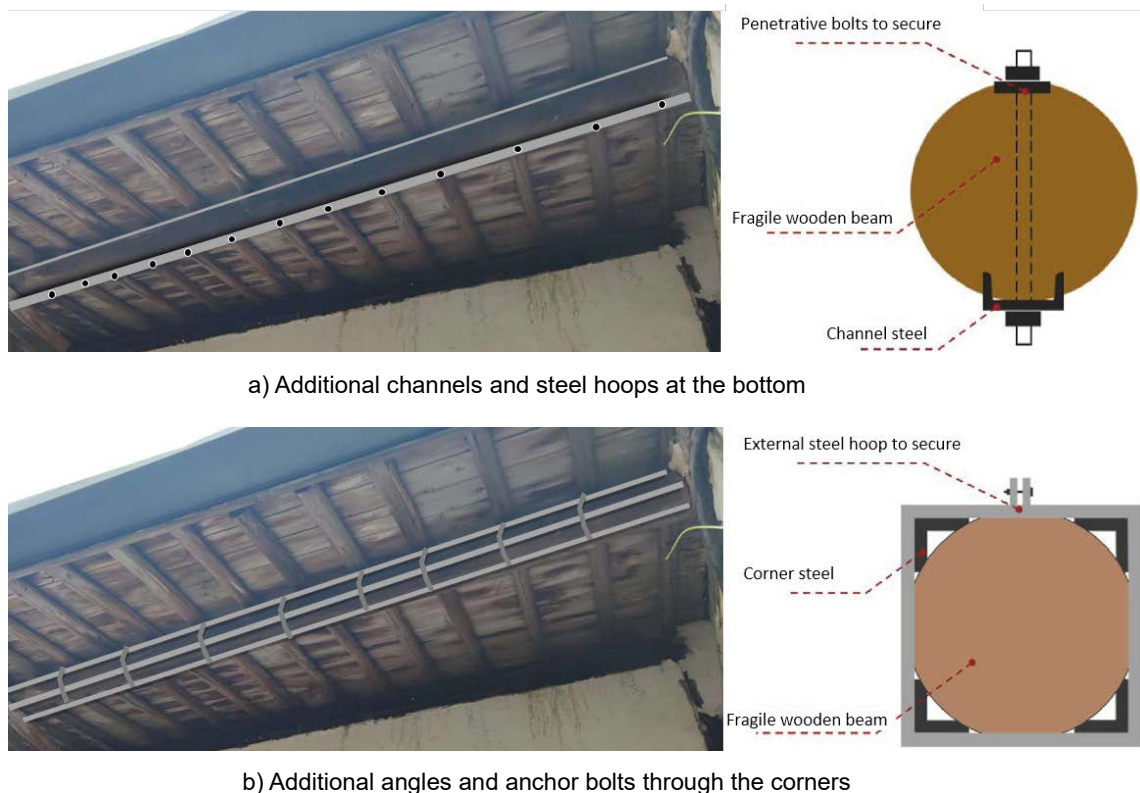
Example of wooden beam structure reinforcement (source: reference [1])
